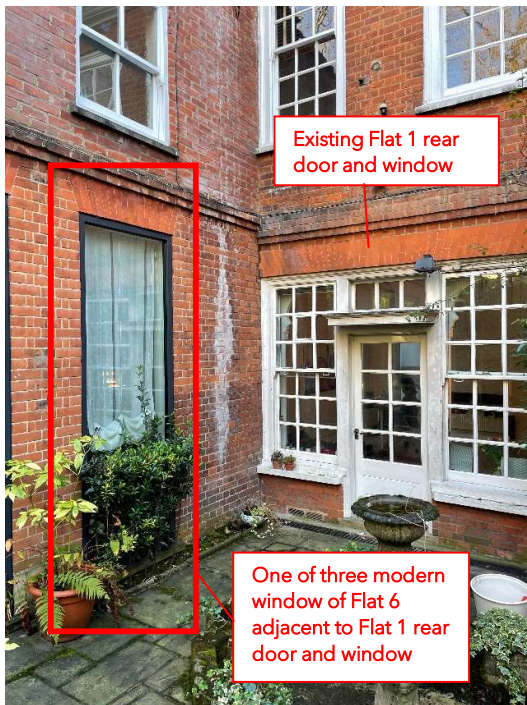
View of rear garden door and adjacent flat 6 modern glazing
